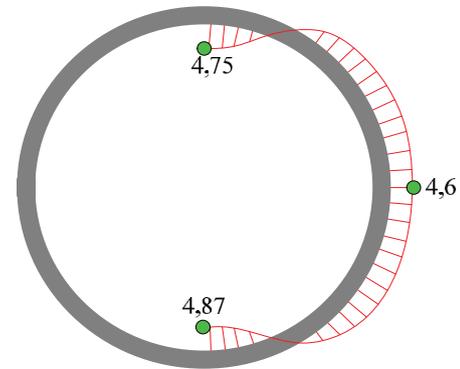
Deformation distribution diagram in the concrete pipe at the time of cracking
